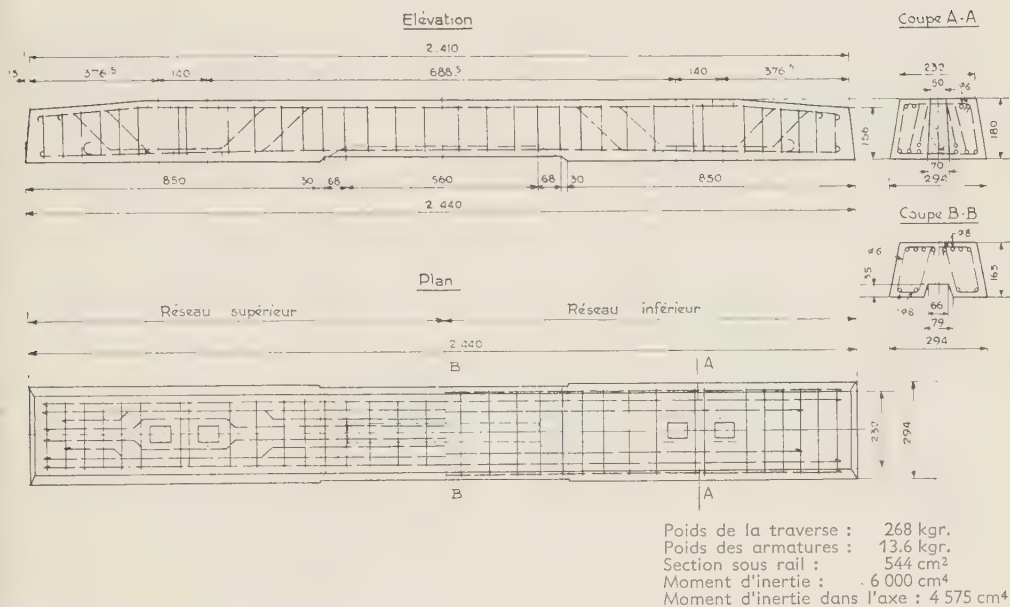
Hungarian Railways*. Monoblock reinforced concrete sleeper.
